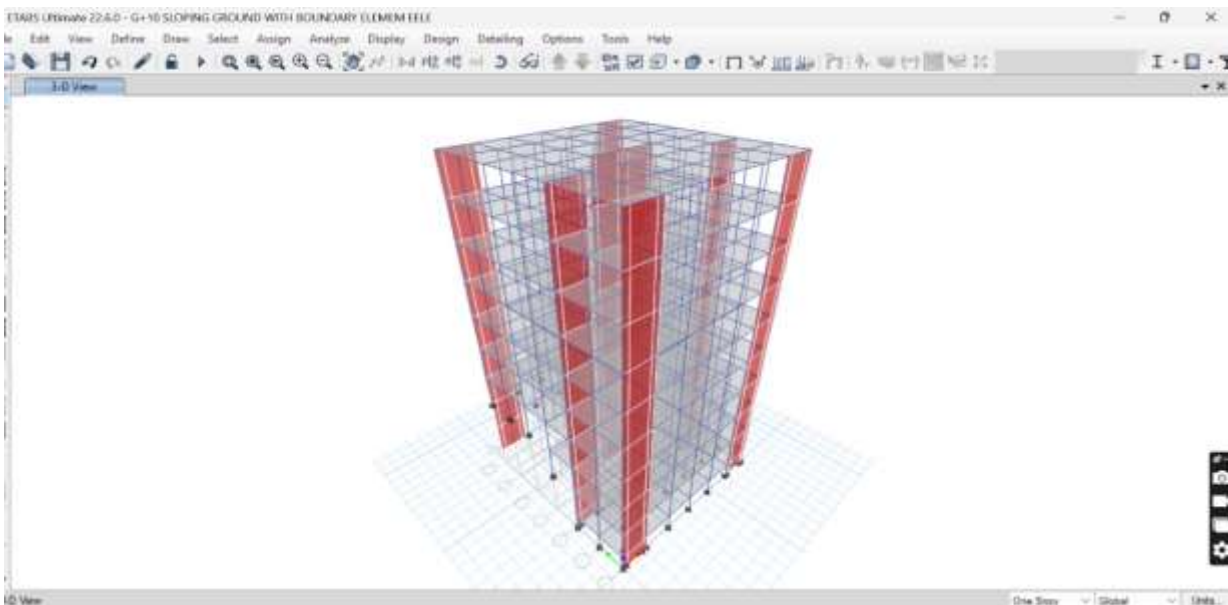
3D ETABS Model of G+10 Building with Shear Walls on Sloping Ground
